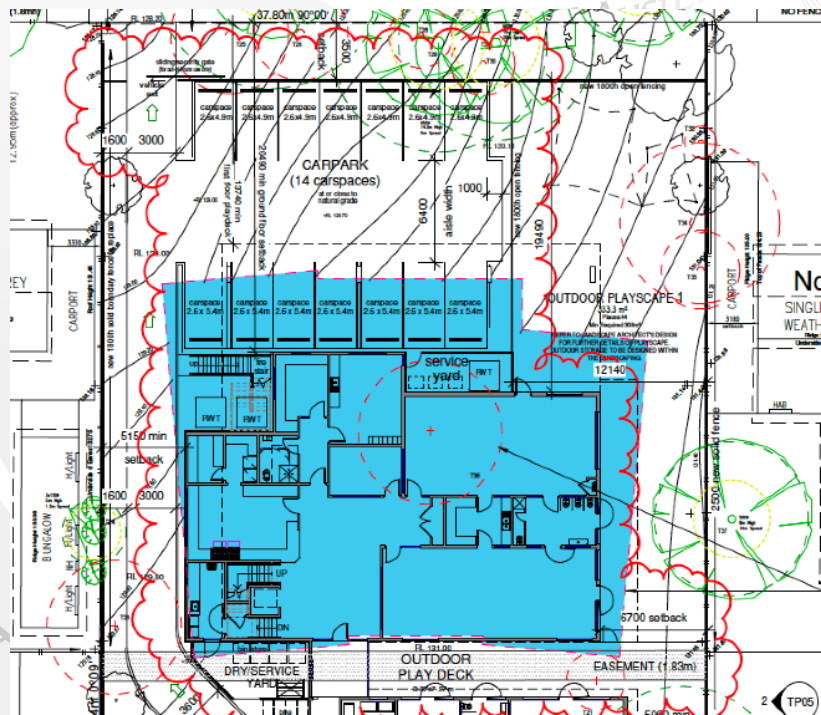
Proposed ground level layout of northern building, existing building footprint is shaded in blue.
